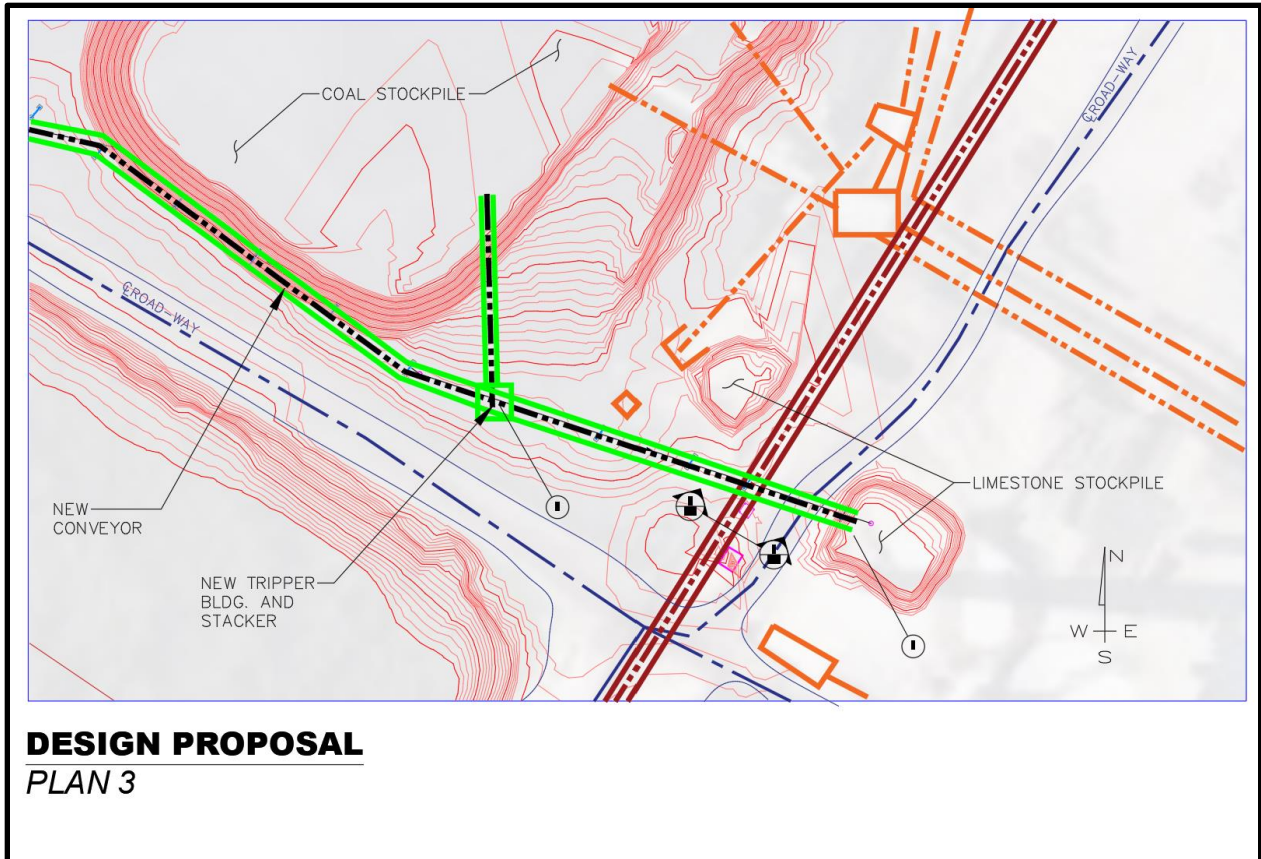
Plan View of Conveyor to Coal & Limestone Stockpiles
